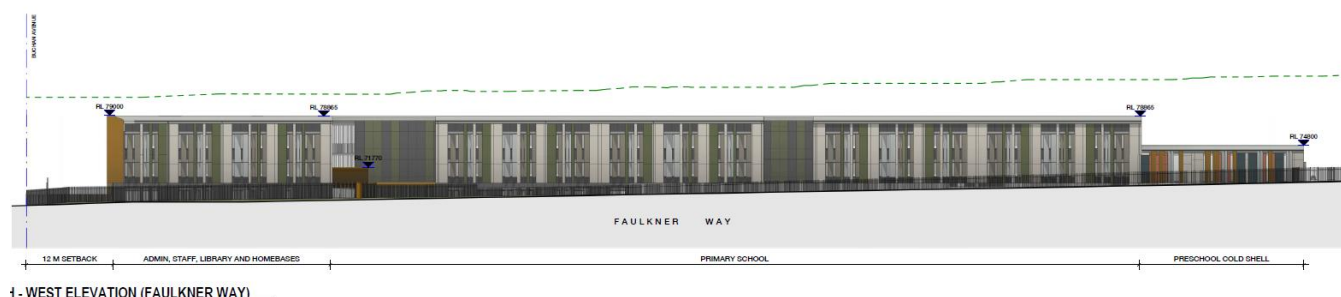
Extract of western elevation (Faulkner Way) as submitted in the RtS (Source: TKD)
